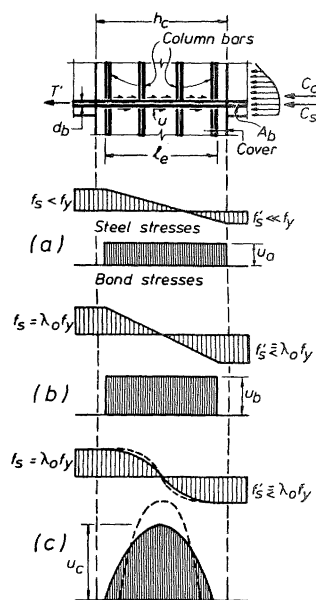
LONGITUDINAL AND BOND STRESSES ALONG A BEAM BAR PASSING THROUGH A JOINT
